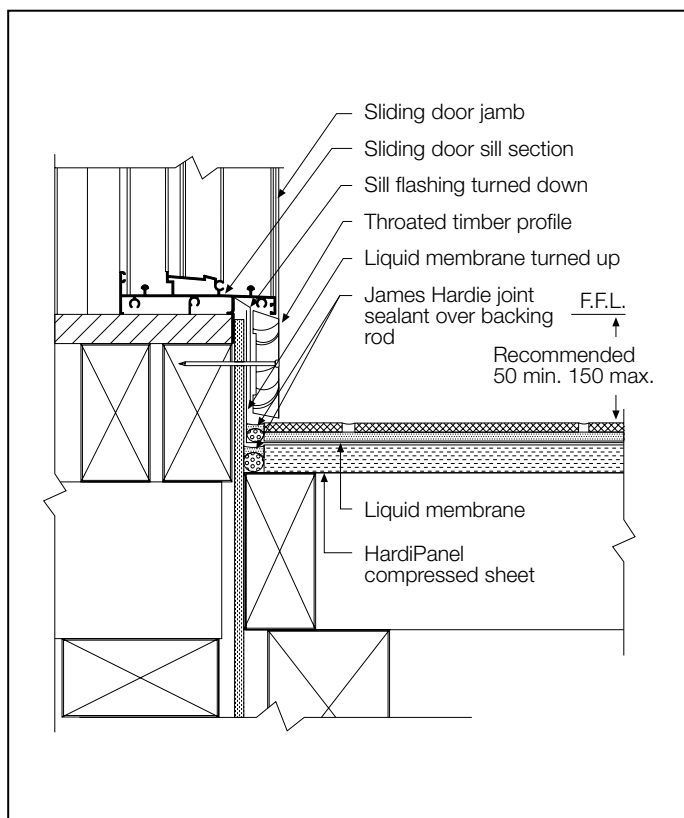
METHOD 2 - STEP DOWN AT DOORWAY DETAIL
